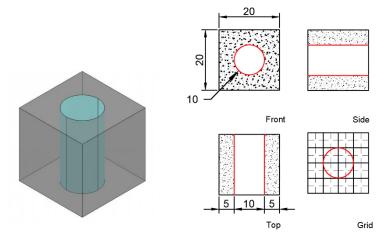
Concrete specimen with a 10cm PVC sewer pipe.
